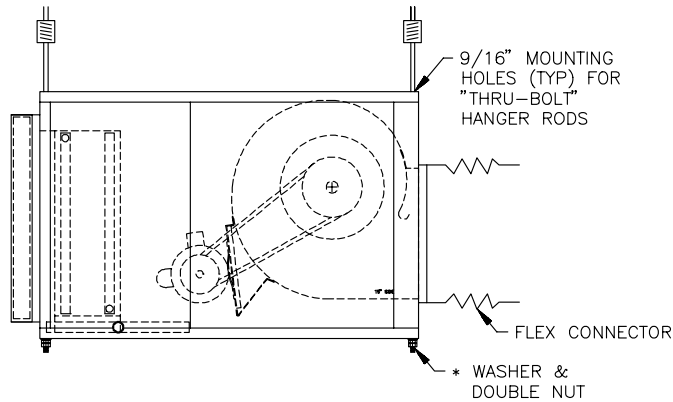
HORIZONTAL UNIT (ALL SIZES) WITH THRU ROD CONNECTION
